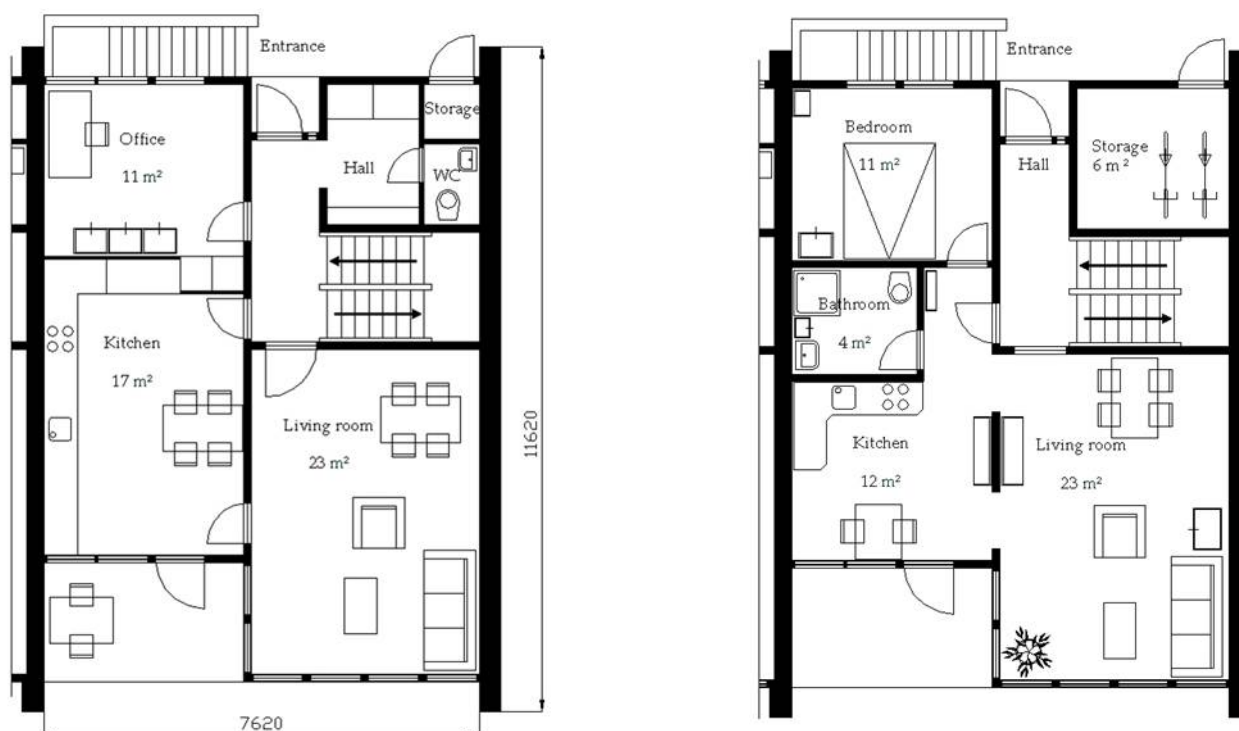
Gilleskroken ground floor level, left the existing situation, right the proposed new situation.
